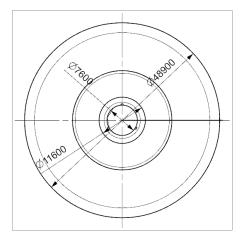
Bottom view of the counter weight with dimensions (mm) [own source].
